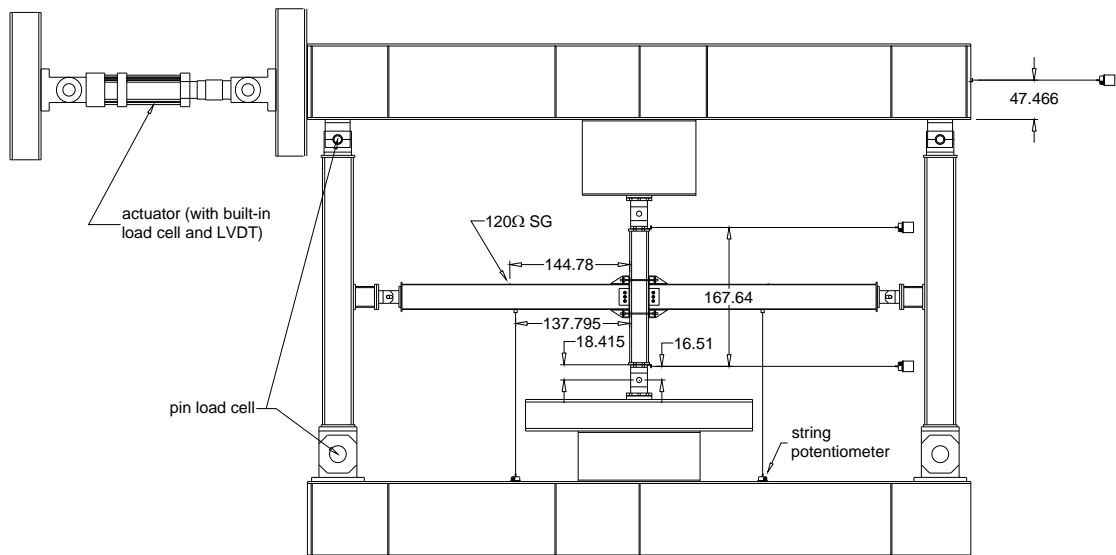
Instrumentation of loading frame and specimen. Units in cm.
